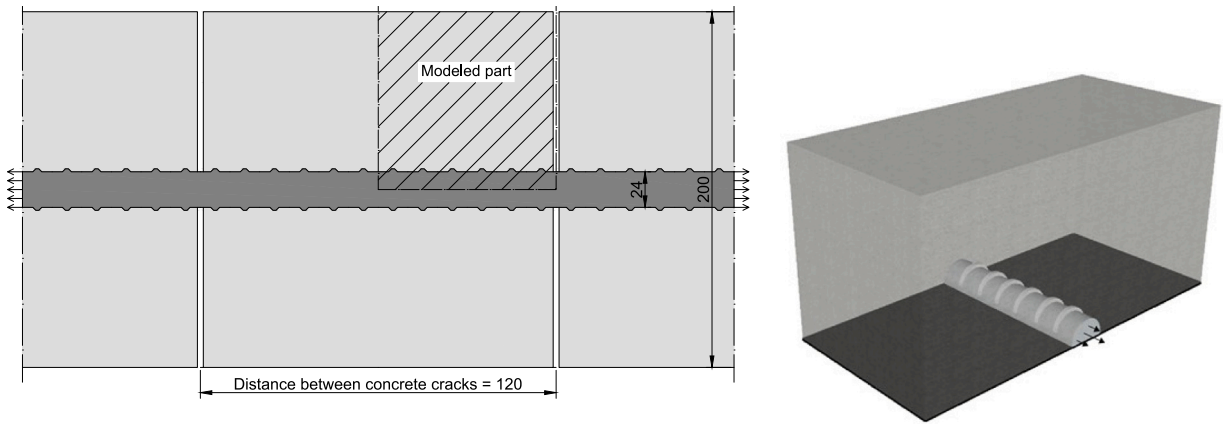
Schematic of the model of the rebar embedded in cracked concrete (dimensions in mm, not on scale).
